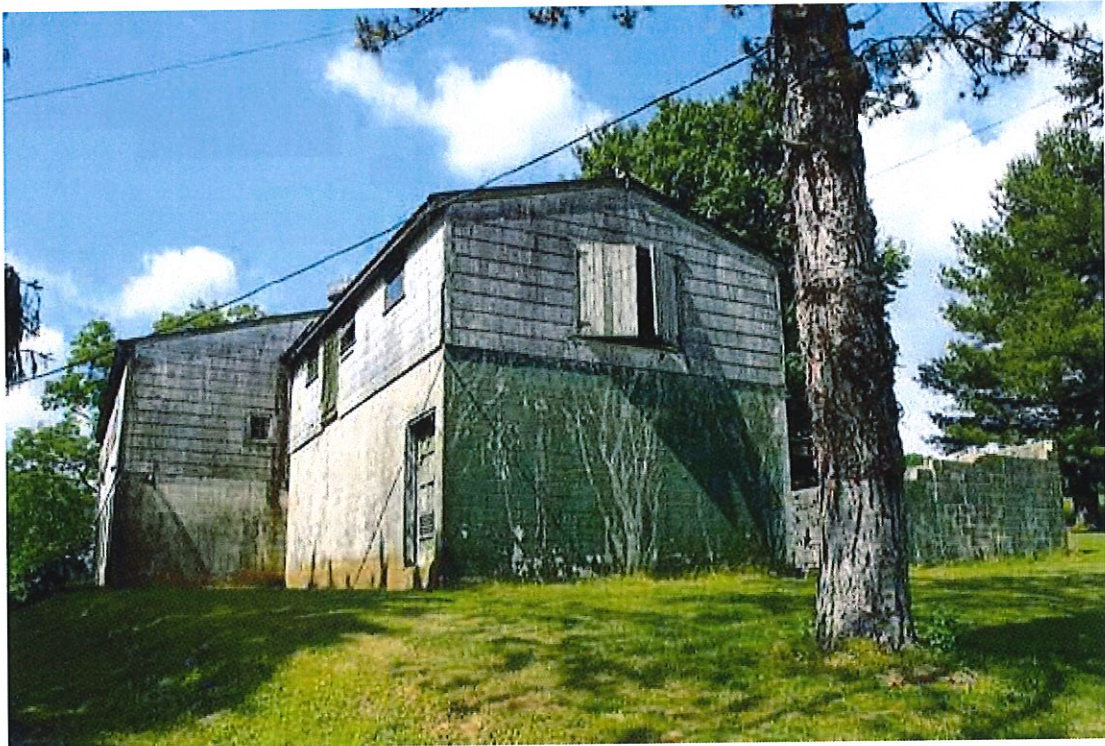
View of the southwest (front) and southeast (side) elevations of the *circa*-1940 machine shed 2, facing north. Note the remnant framing from the earlier structure visible on the southeast elevation (June 2016).
